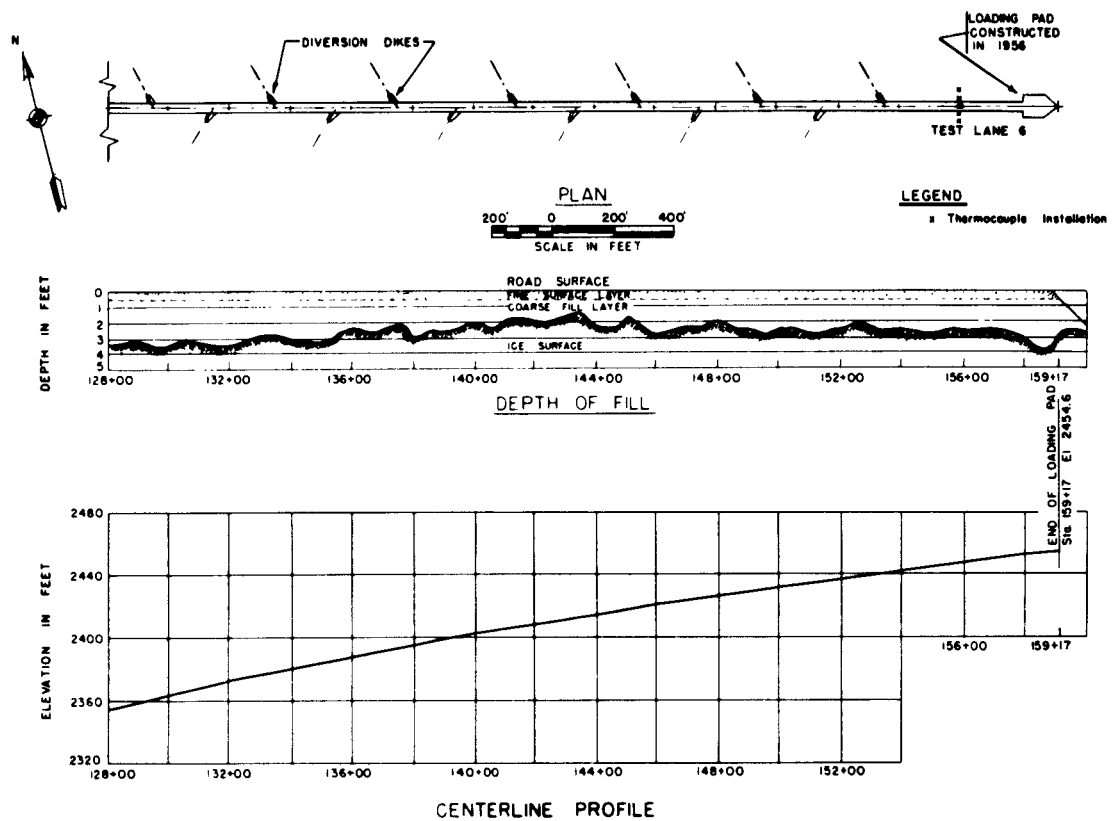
Plan and profile, Ramp Road, September 1957, Stations 128+00 to 159+17.
